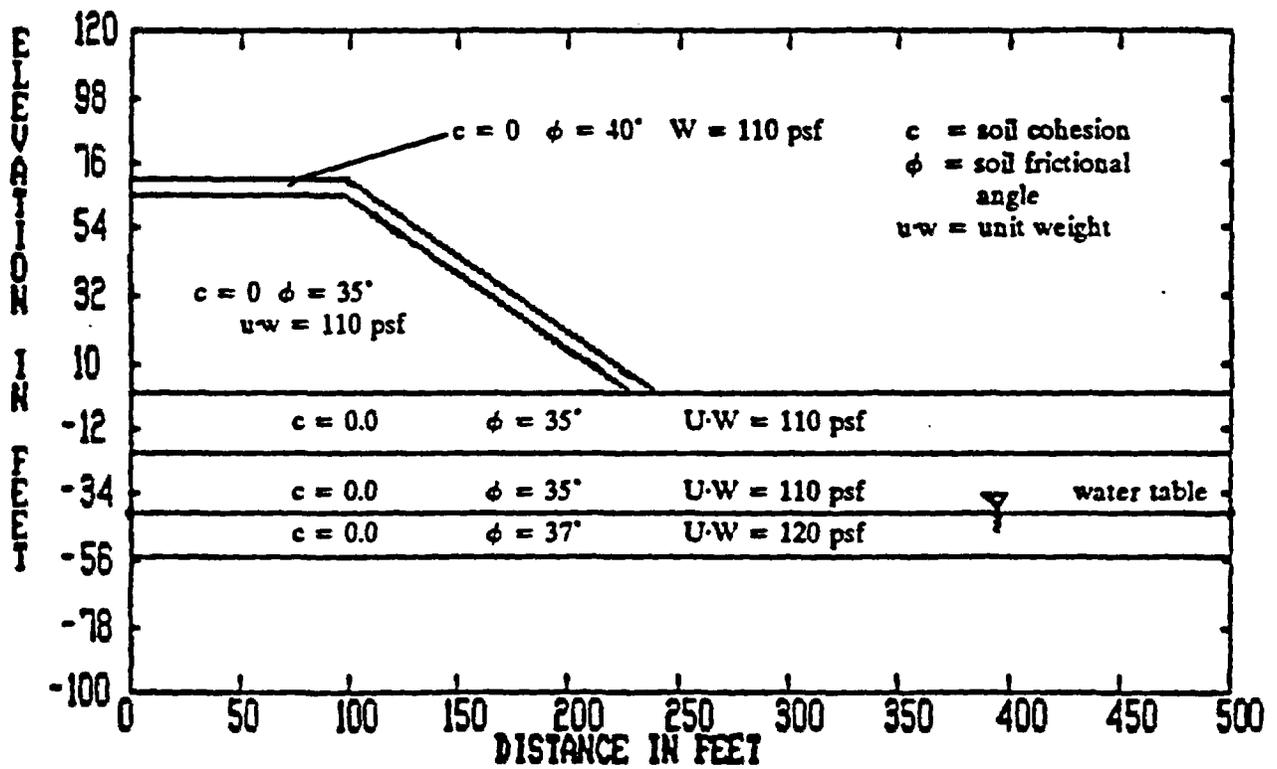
CROSS SECTION OF THE NORTH SLOPE
